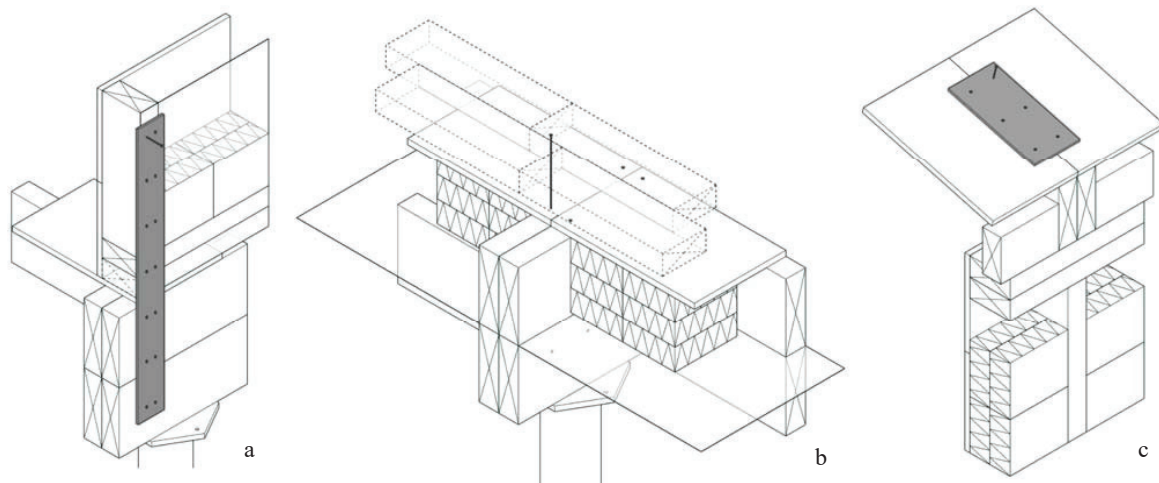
Inter* reversible connections detail: a) Wall (LBV perforated plate (60 × 600 × 1.5 mm)); b) Floor (HBS screws 8×100 mm) and c) Roof (LBV perforated plate (100 × 200 × 2.0 mm))
